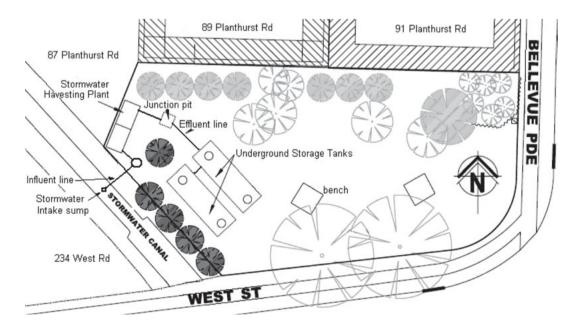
Carlton Stormwater Harvesting Plant, Kogarah, Sydney.
